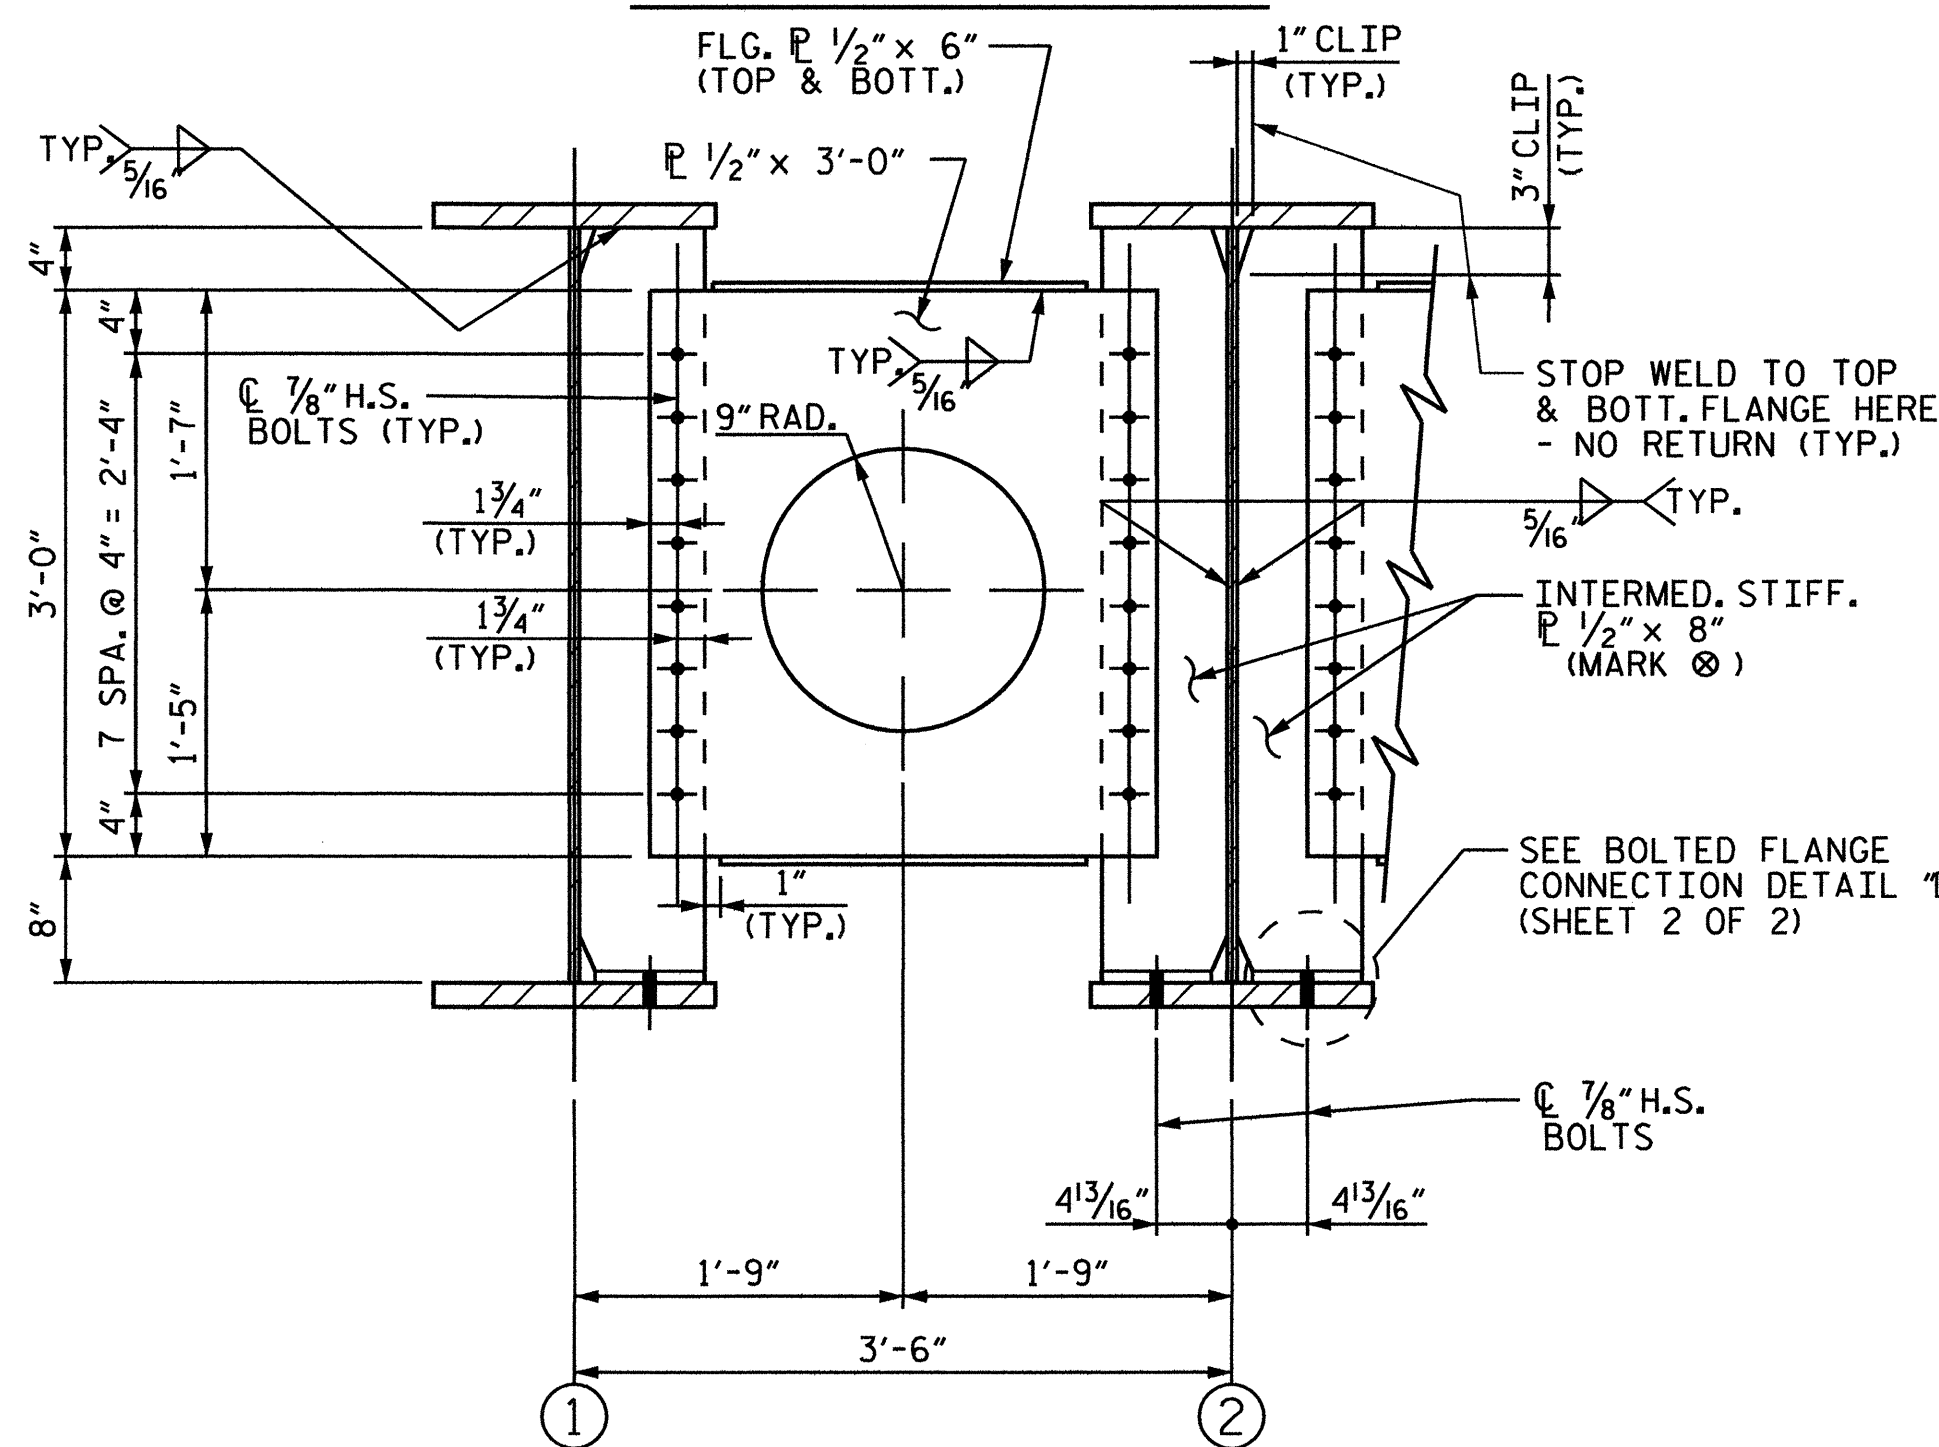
DETAIL OF STIFFENER PLATE WHEN NOT USED AS A CONNECTOR PLATE
